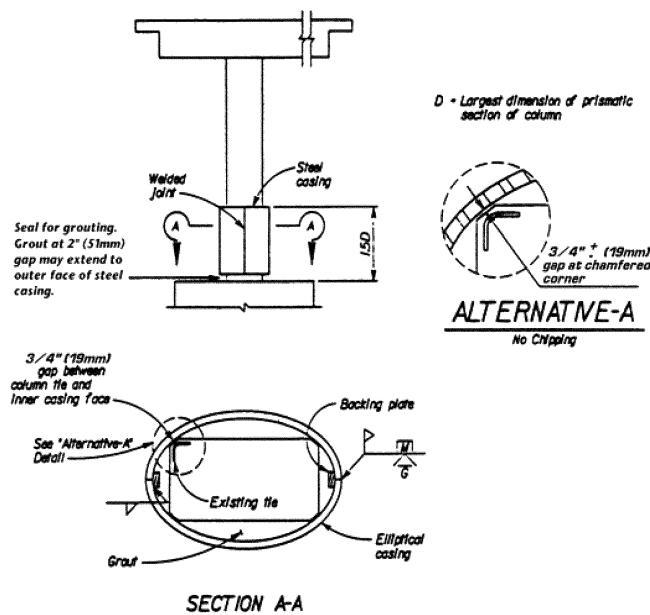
Elliptical steel jacket retrofit for a rectangular column section.
